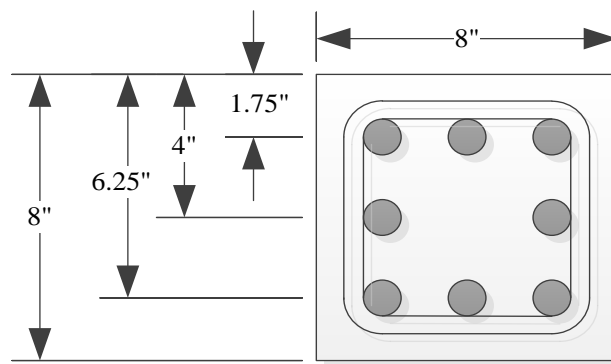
Cross section of BFRP Beam (UHP-FRC #3 and #4).
